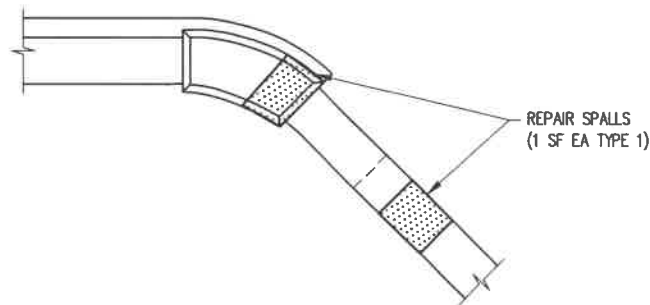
DETAIL - MULTIFACE SPALL REPAIR 1
